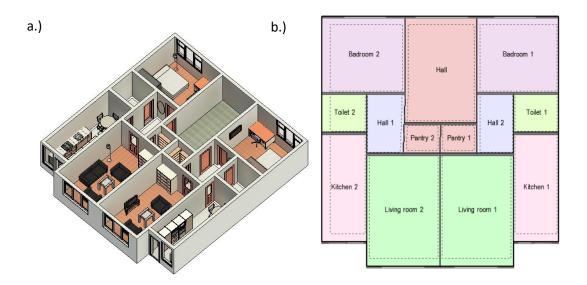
Example of the floor plan in selected building, a.) Autodesk Revit 2021 model, b.) Design Builder model
